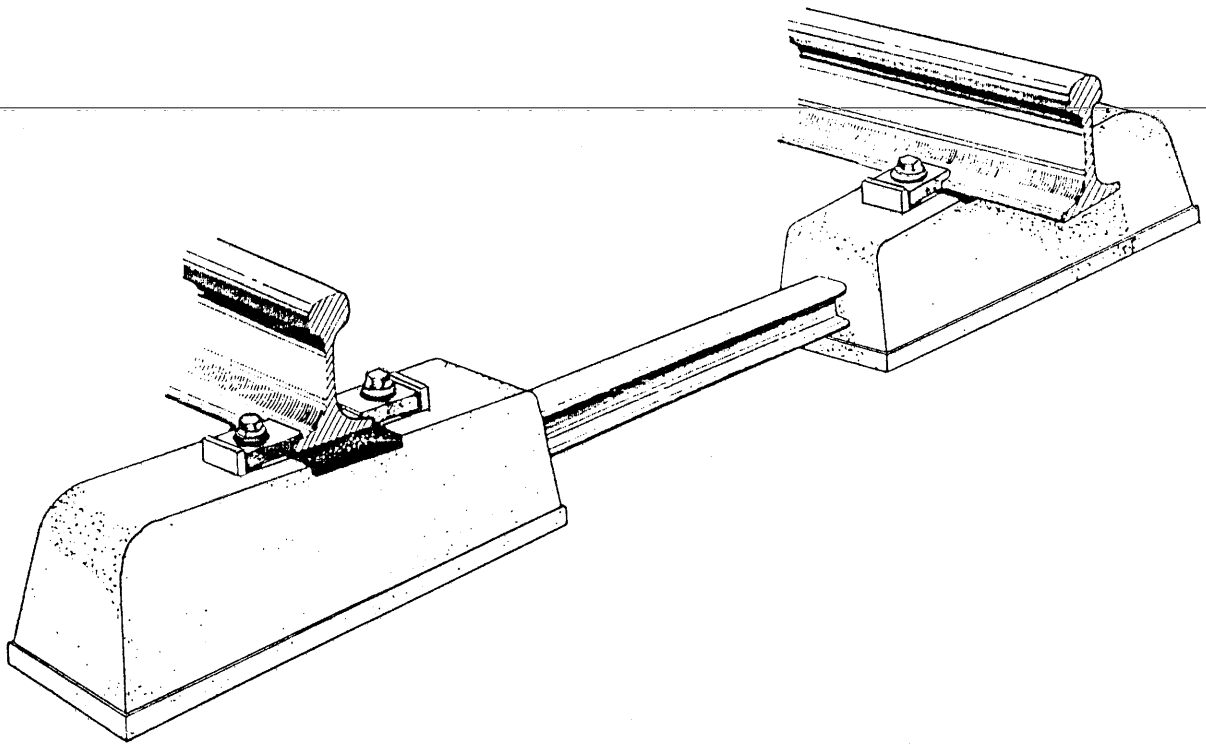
Nucor Steel and Concrete Tie with Viseking Fastening System.
